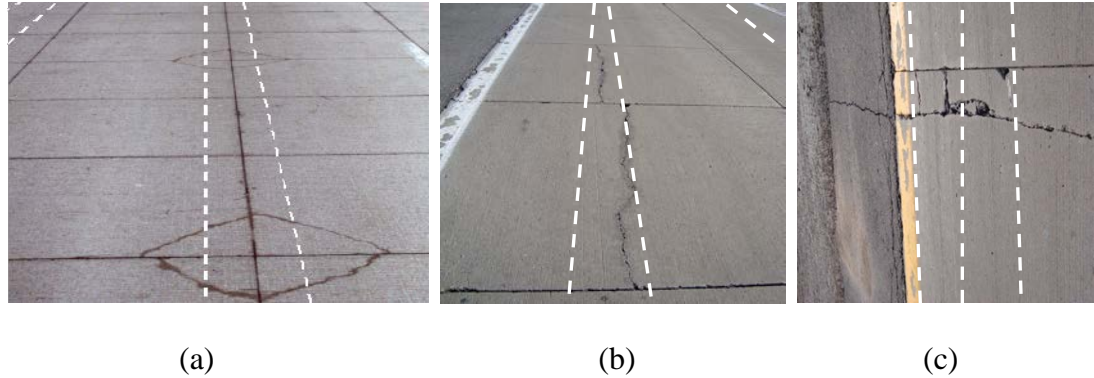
Common failure modes in whitetopping: (a) Corner crack in shorter slabs, (b) Longitudinal crack in larger slabs and (c) Reflected transverse crack
